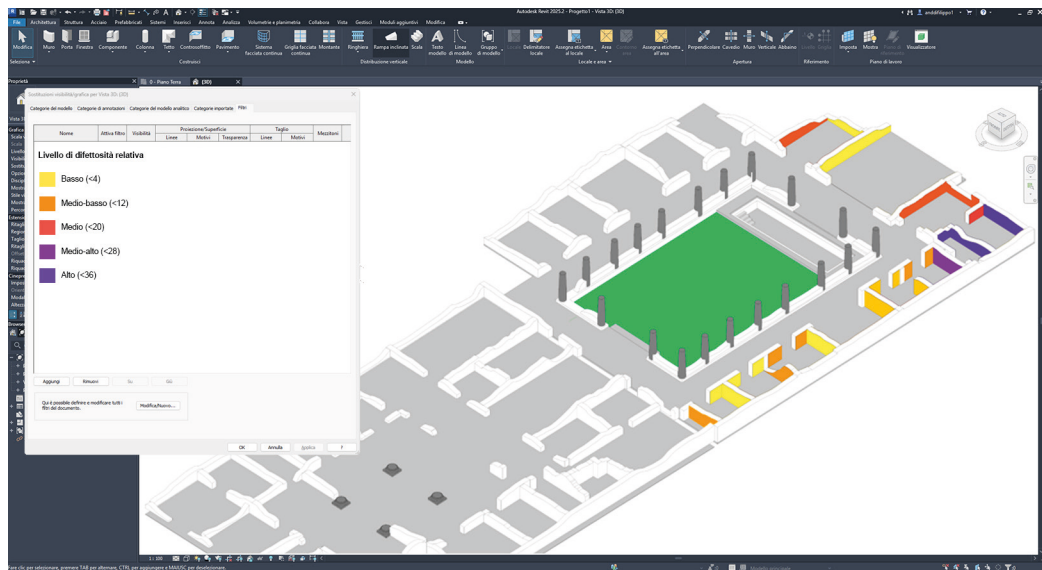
View of the BIM model, with the construction techniques used for the wall faces highlighted in false colour.
